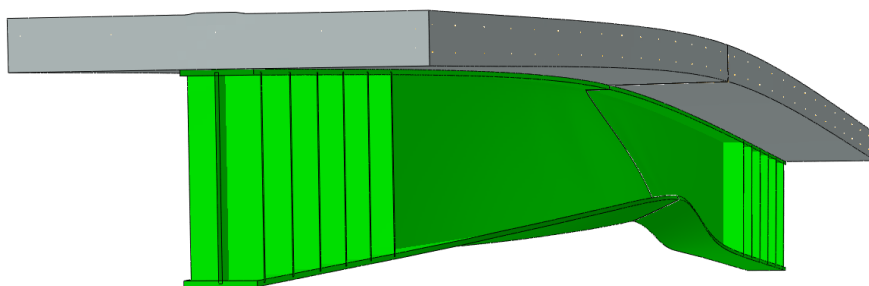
LDB deformed shape in steel-concrete composite beams.
